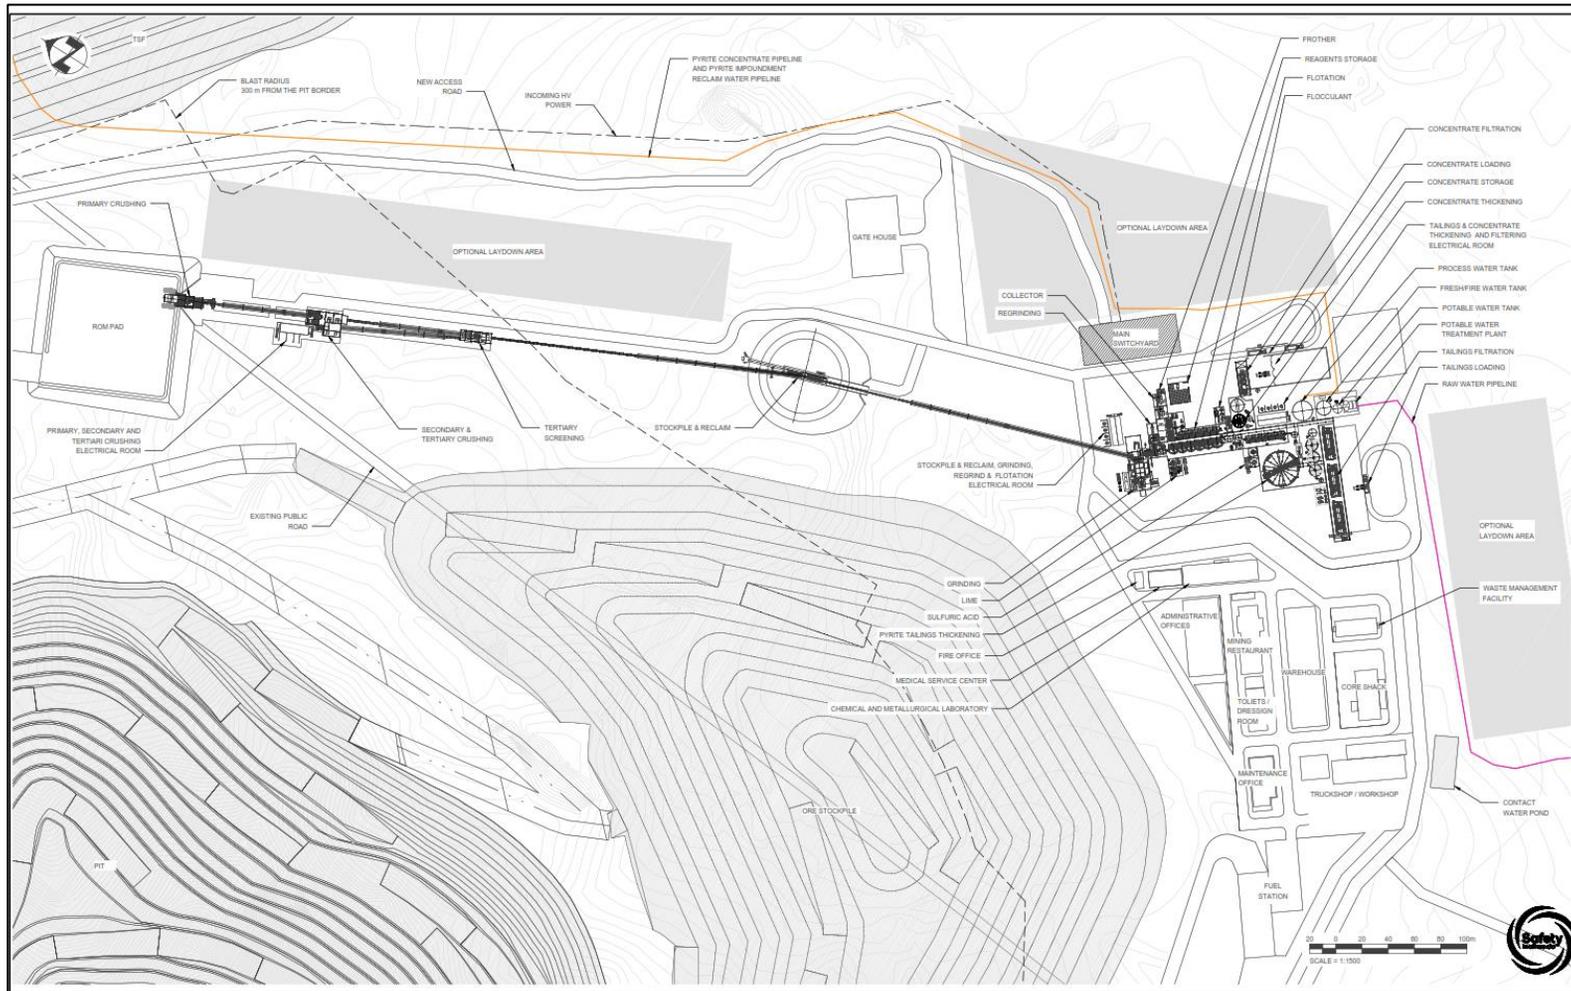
Proposed Plant Site Layout (Ausenco 2021)
